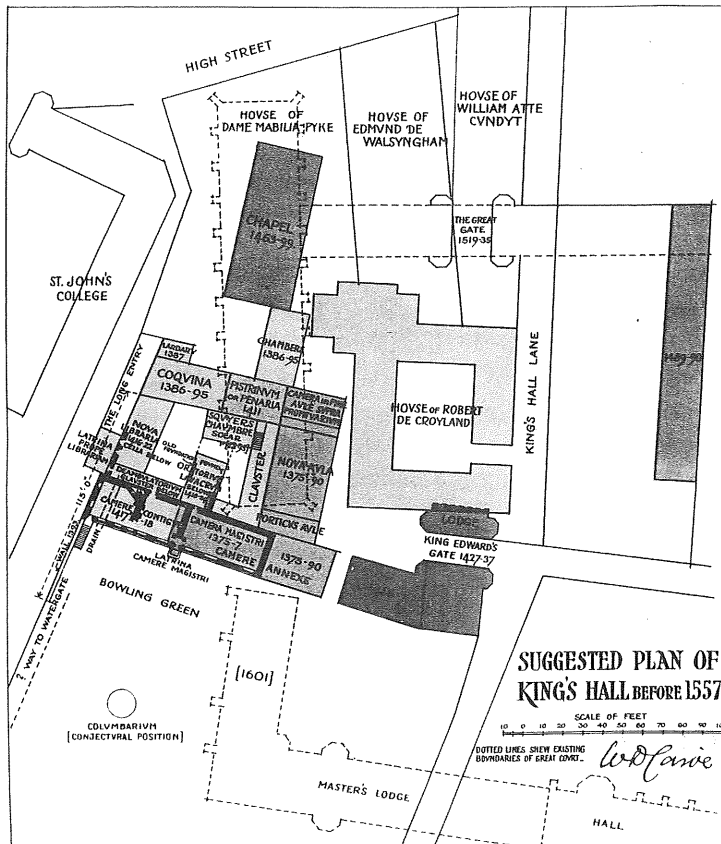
Caroe's plan of King's Hall, Cambridge, before 1557
